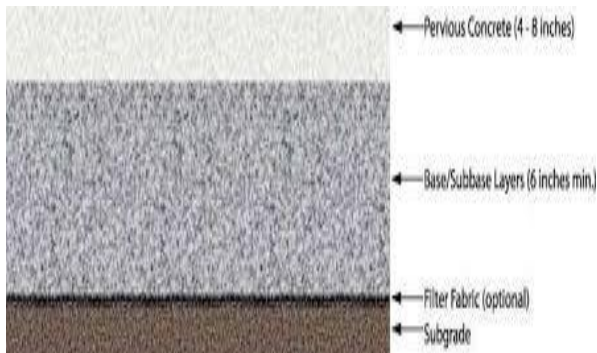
Typical pervious concrete pavement section adopted from EPA2015
